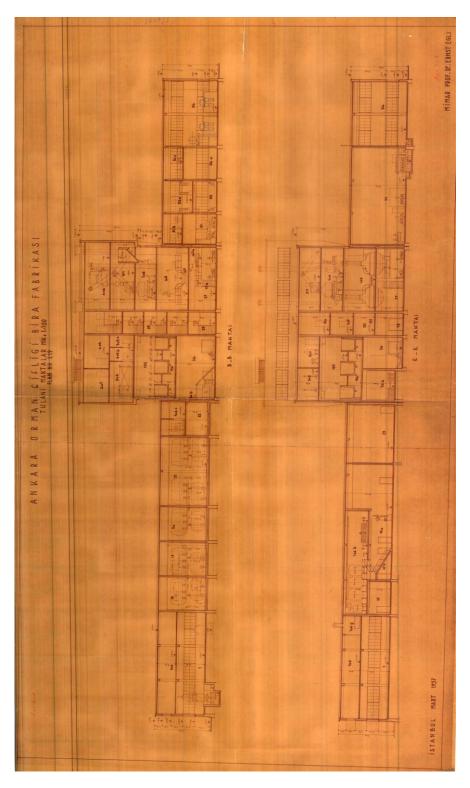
The original drawing of the fermentation building, the sections (Source: T.T.A Archive)
